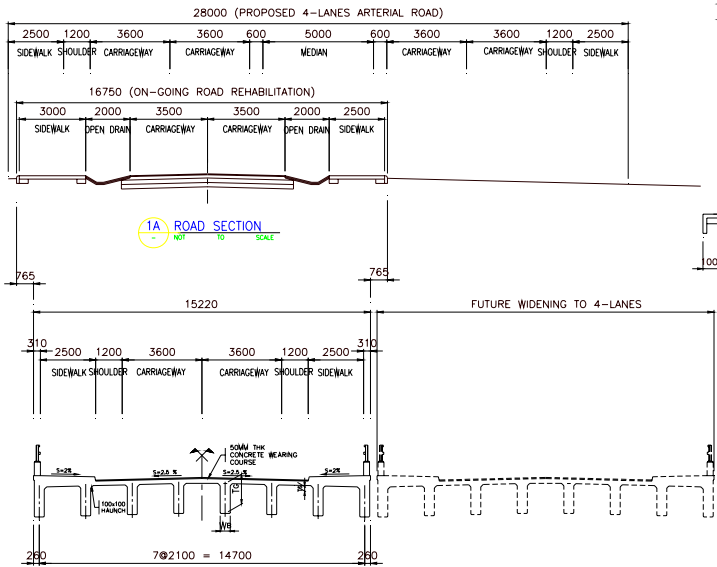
(a) Proposed Bridge Cross-Sections
